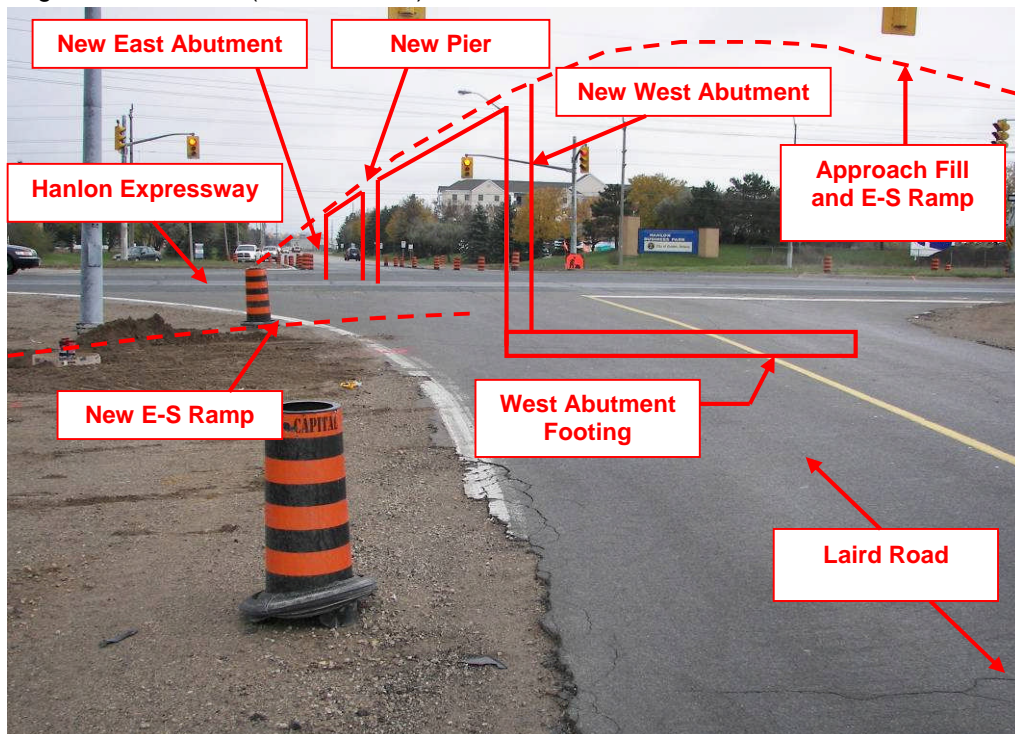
Viewing northeast towards new pier location and new E-N ramp alignment (in the distance) from southwest corner of Highway 6 and Laird Road intersection. (Nov. 15, 2007)
